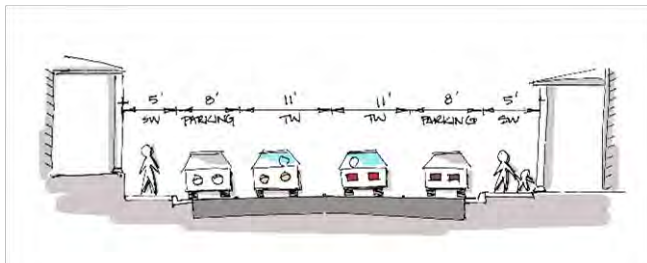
Diamond Springs Enhanced Sidewalks and On Street Parking Cross Section and Rendering
